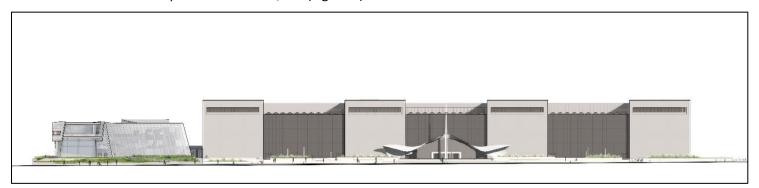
Proposed north section of the building. (Perkins&Will, 2024)
